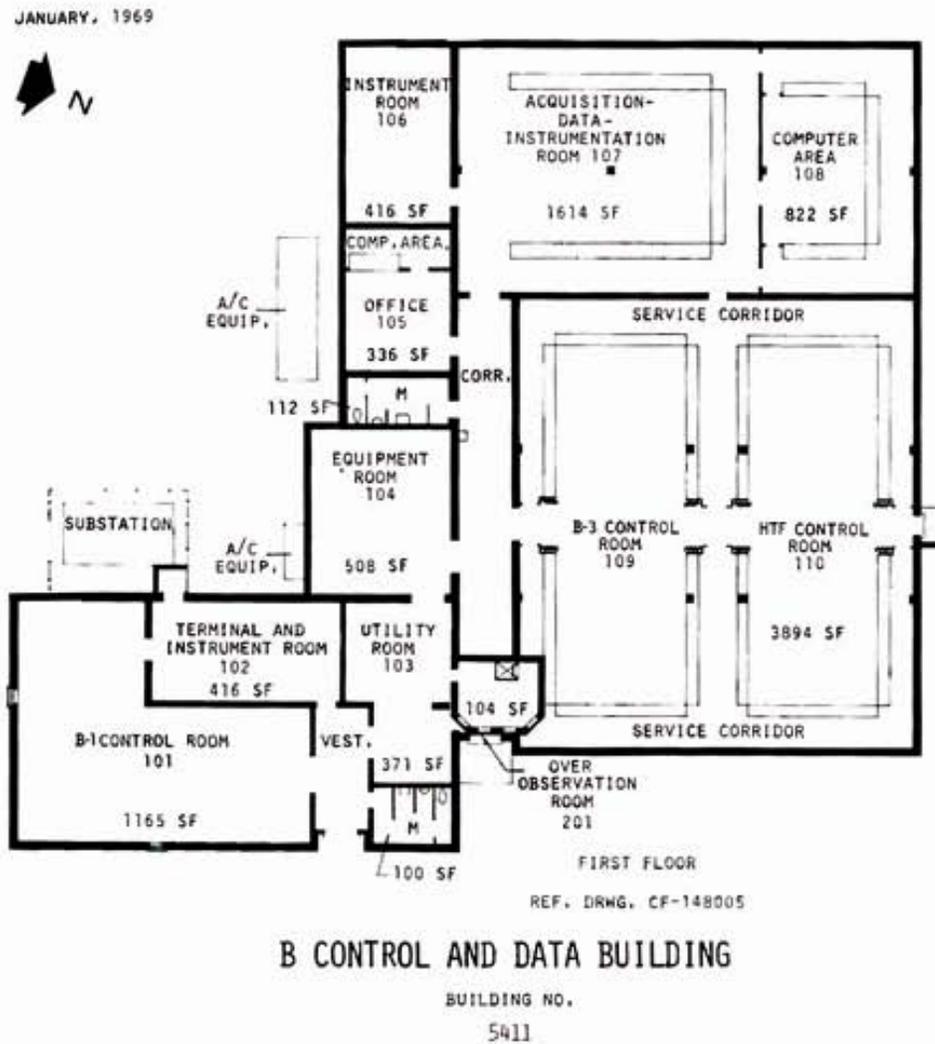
Floor plan for the B Control and Data Building, 1962 (Plum Brook Station Plans and Structures, NASA Glenn History Collection).
